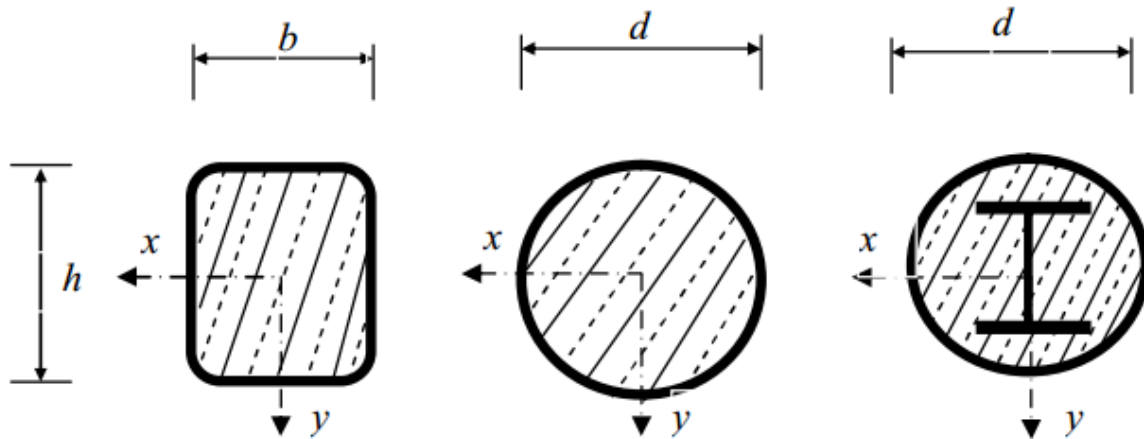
Typical cross - sections of fully and partially concrete encased columns[Dong Keon Kim, (2005)].
